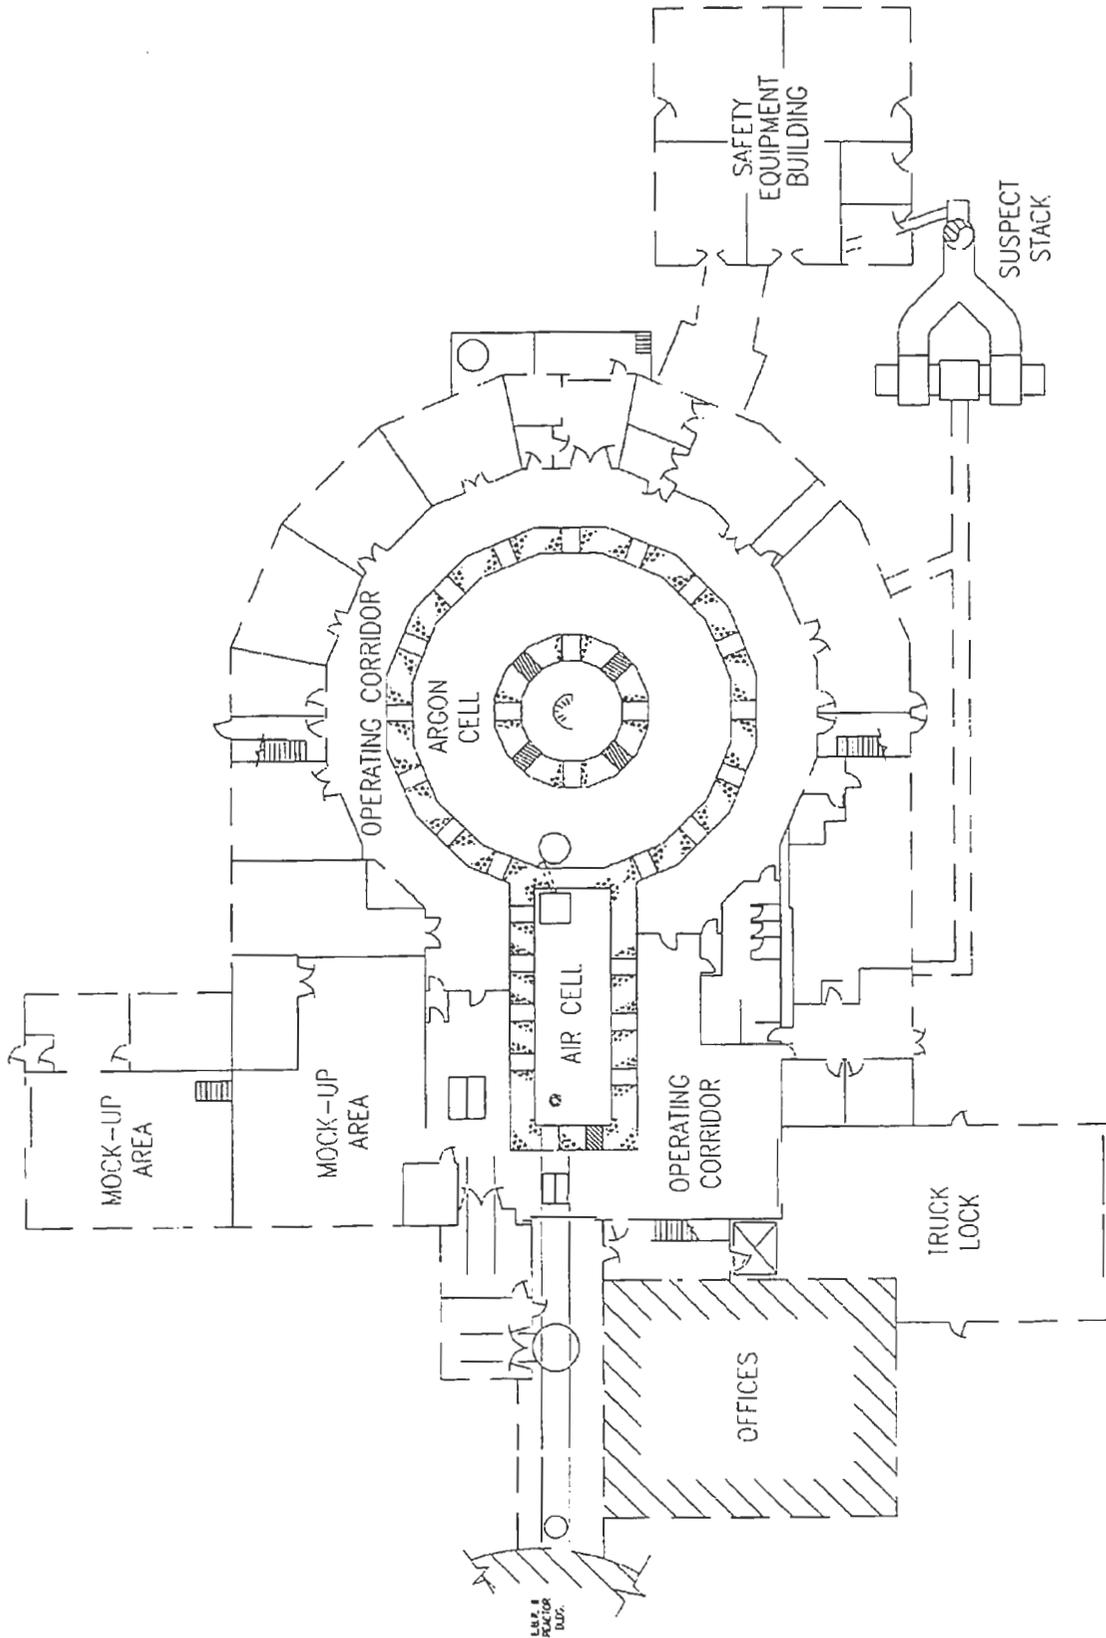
Layout of the FCF and the Safety Equipment Building.
